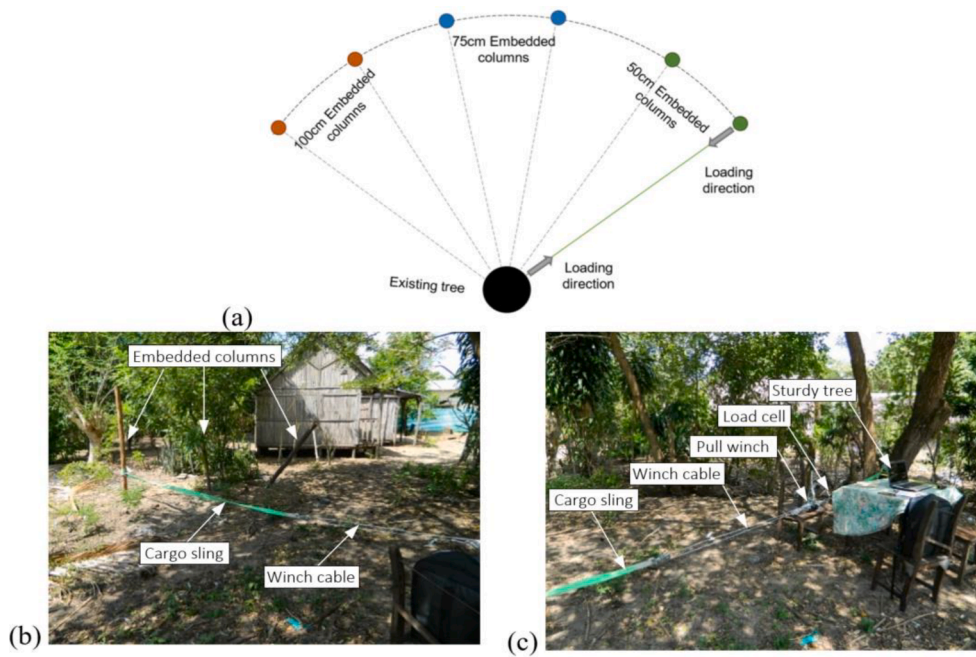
Test setup for embedded column under lateral load (a) setup layout and (b) sling connection to an embedded column and (c) to an existing tree.
